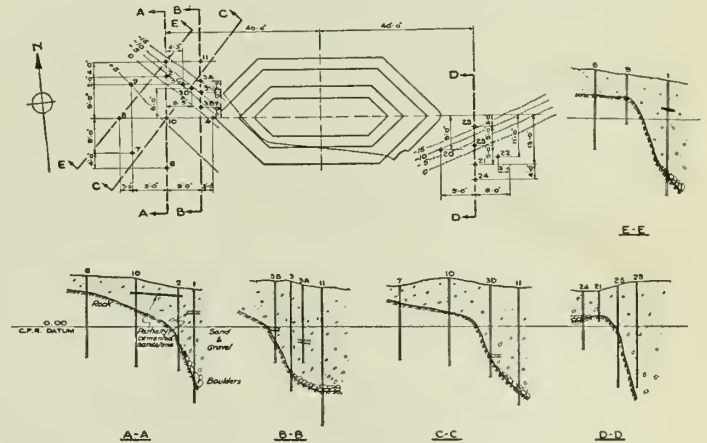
Plan and Sections Showing Borings Adjacent to Pier 2.
